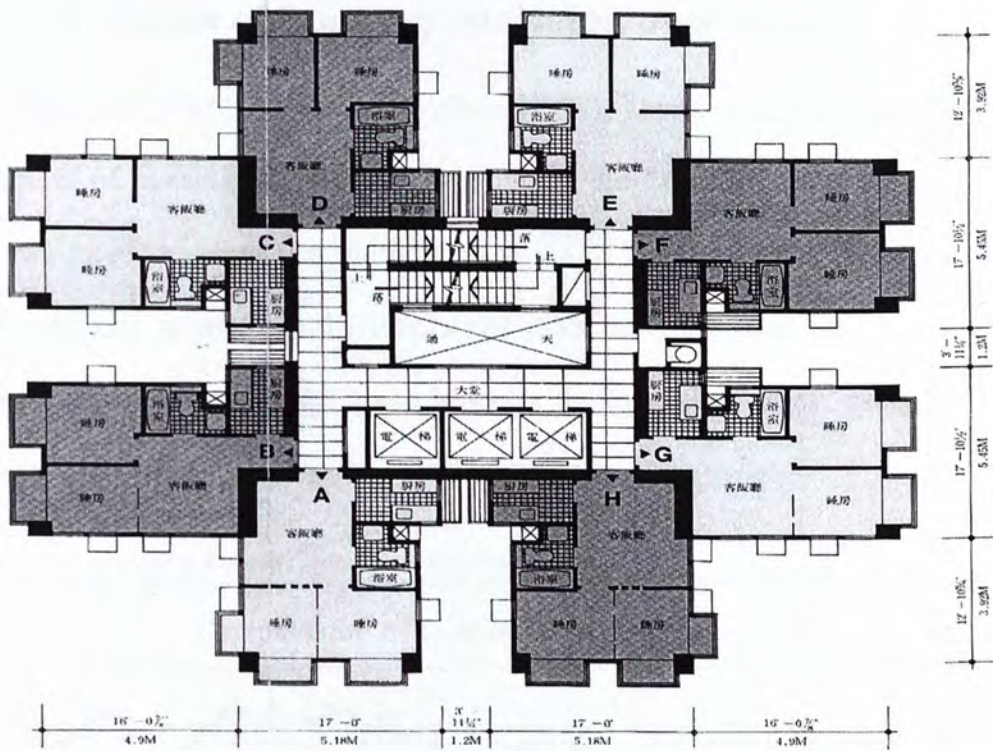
Figure for example 3 (Floor plan of “Rectangular” shape living room)⁴², Tai Po Center
